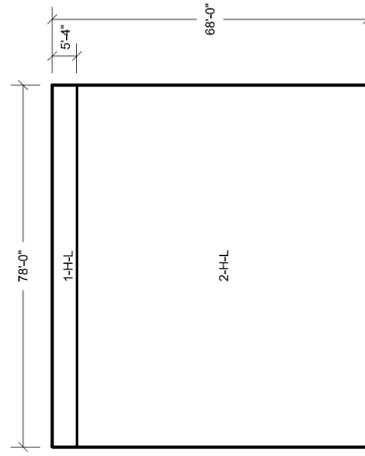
H.6-71: PUMP HOUSE INTERNAL EAST WALL LOOKING WEST
